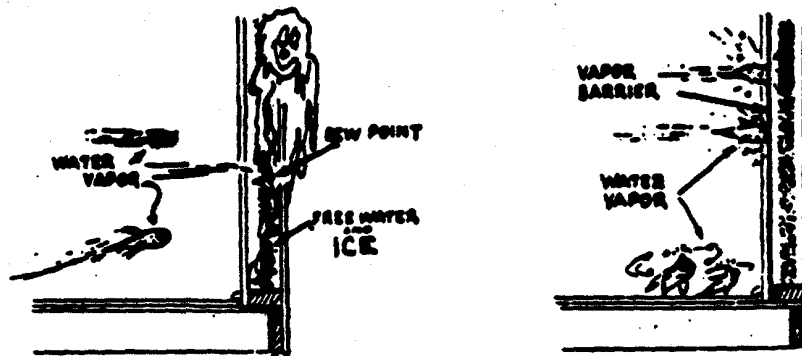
How a vapor barrier prevents vapor from entering an insulated wall.
